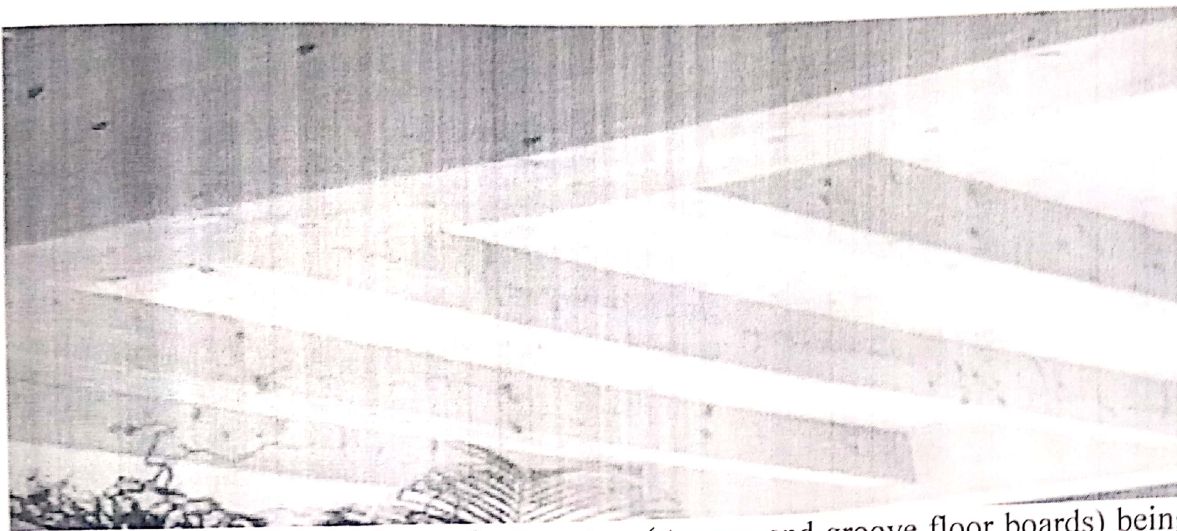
Suspended timber floor system ( tongue and groove floor boards) being supported by the timber joists @ 700mm
